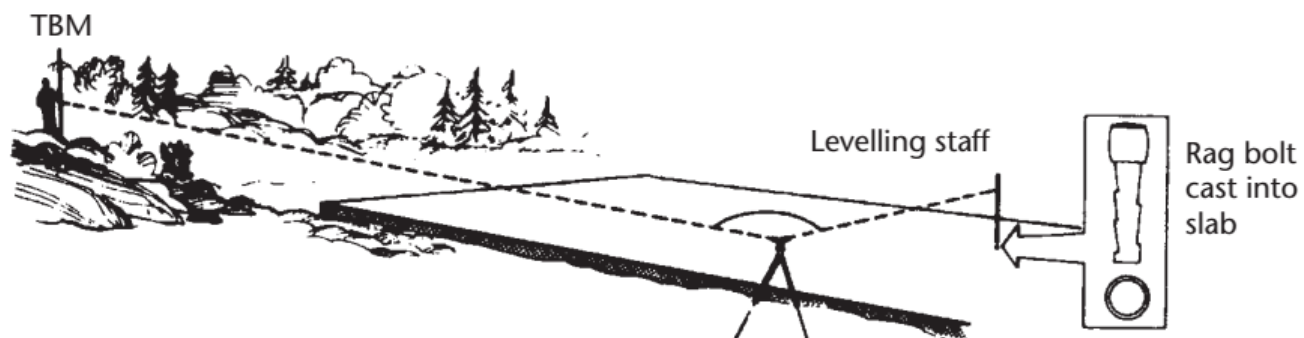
• Transferring horizontal control to a ground floor slab.
